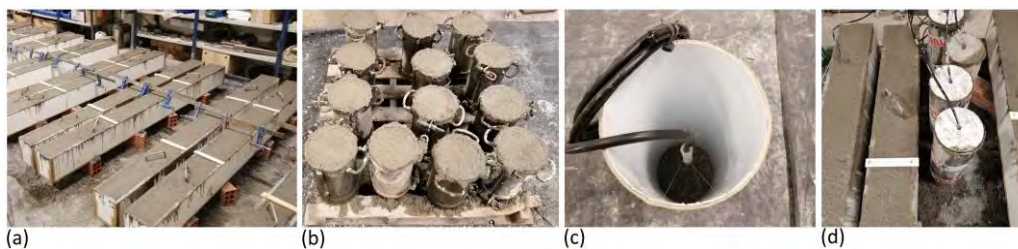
(a) Beam casting, (b) Control cylinder specimens, (c) Mold with embedded strain gauge for creep specimen and (d) shrinkage and creep cast specimens.
